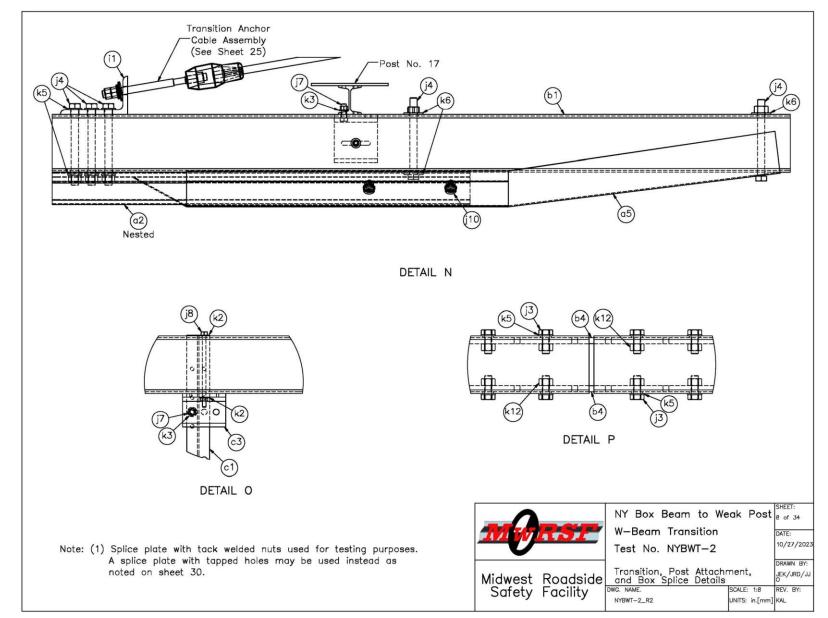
Transition, Post Attachment, and Box Splice Details, Test No. NYBWT-2
